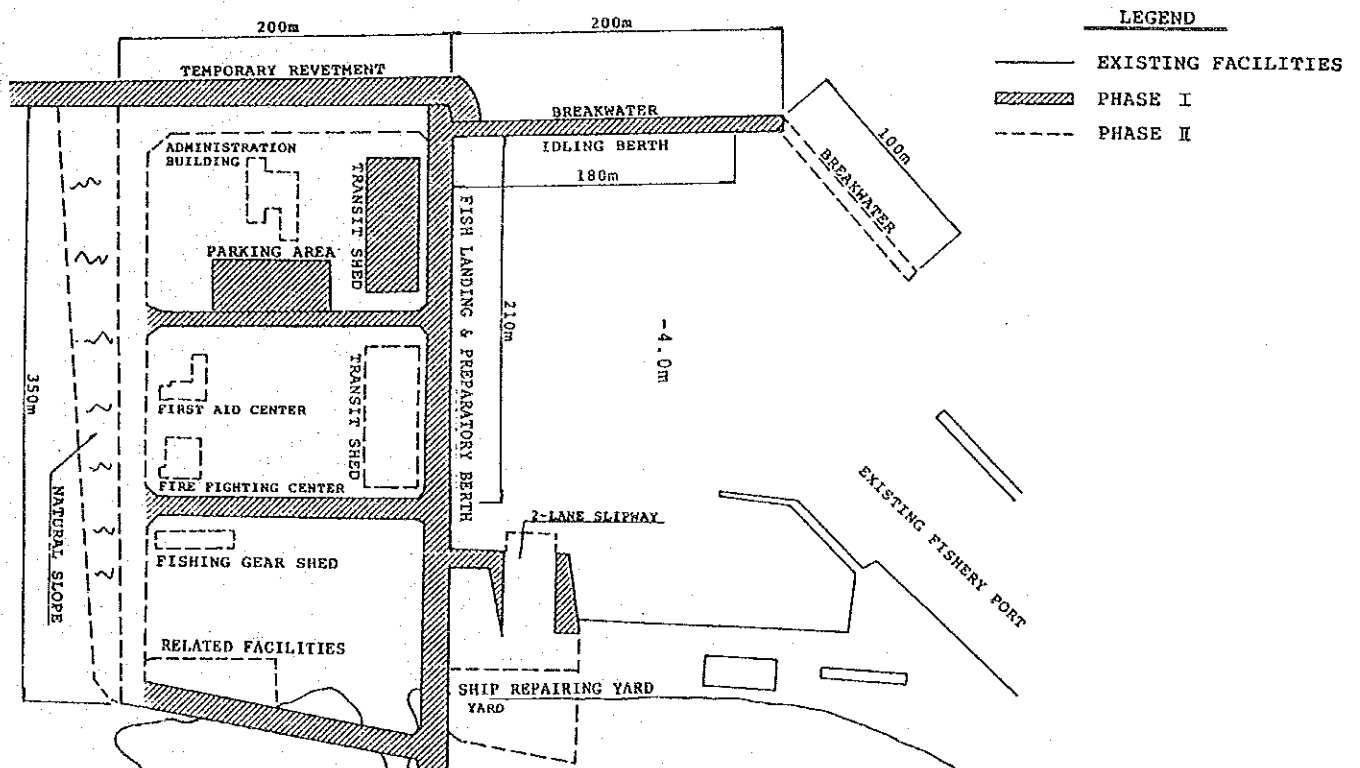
Arrangement Plan of Requested Facilities
